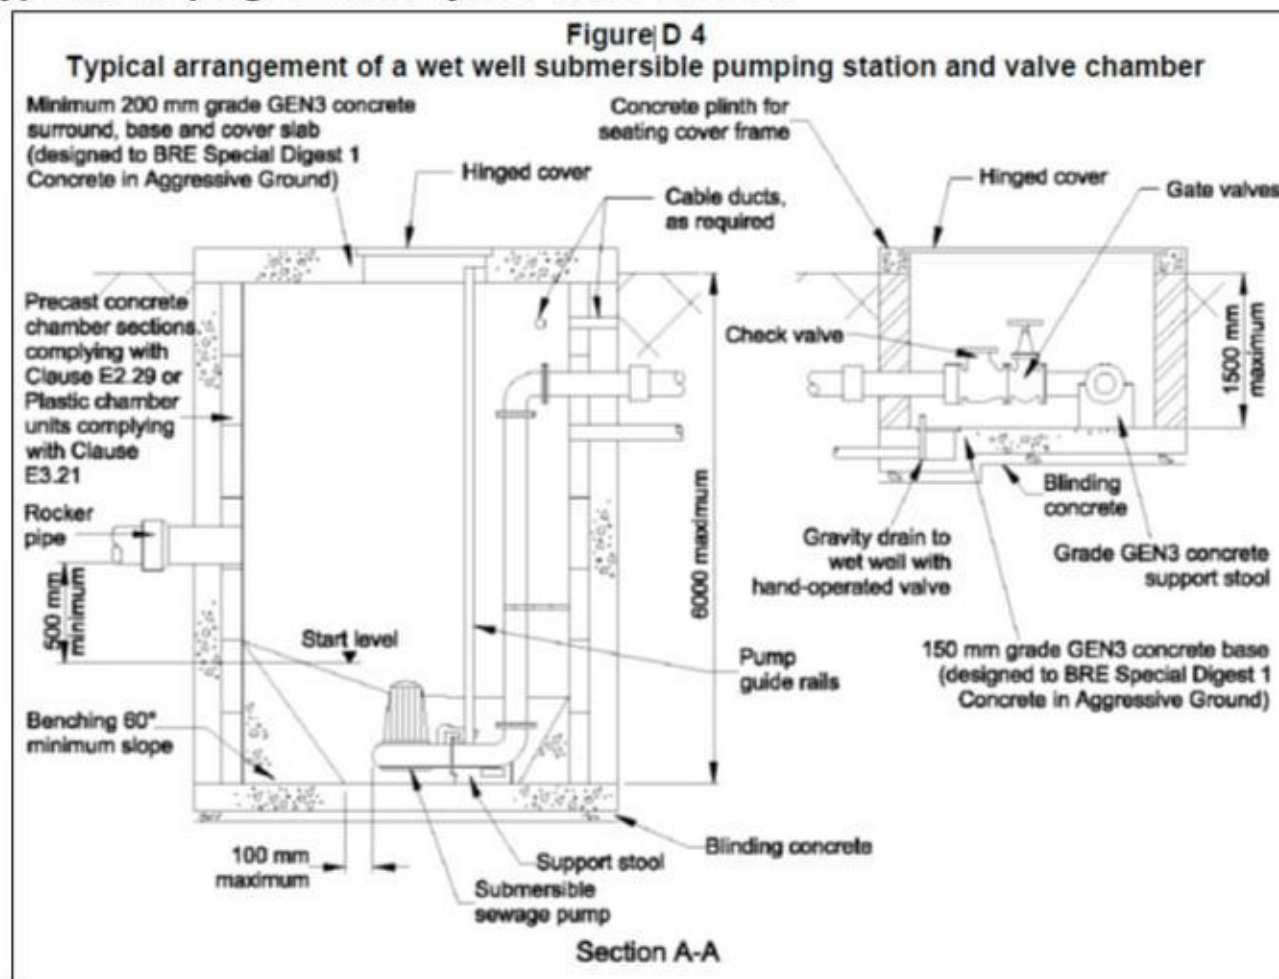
Typical Pumping Station Layout: Cross Section⁴
